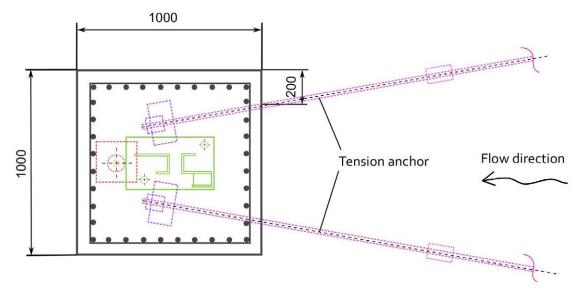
Top view of a reinforced concrete foundation with one pressure and two tension anchors, based on [15].
